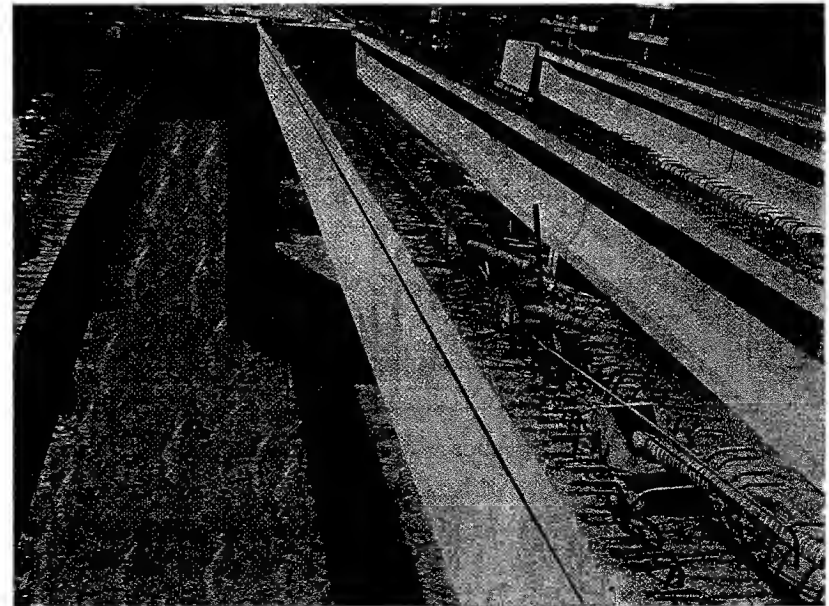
Prestressed concrete beams in 15<sup>th</sup> May bridge before the construction of the concrete deck
